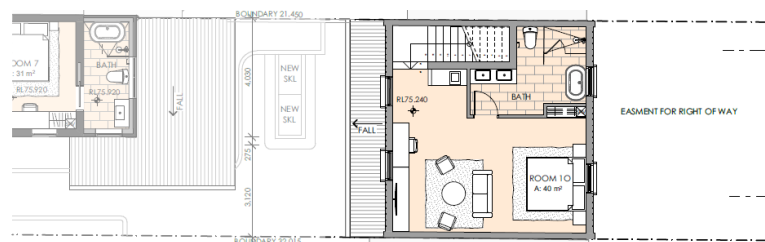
Proposed ground floor west plan – 40 The Avenue, Randwick (Source: PTI Architecture)
